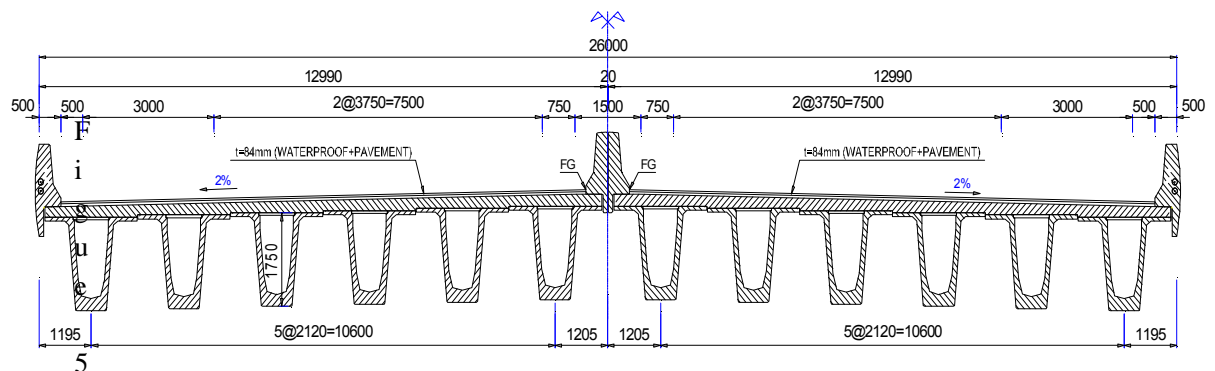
Typical cross section at Approach Bridge
